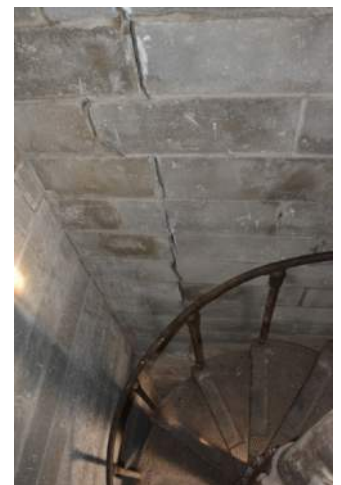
Interior South East Stairwell vertical wall crack
